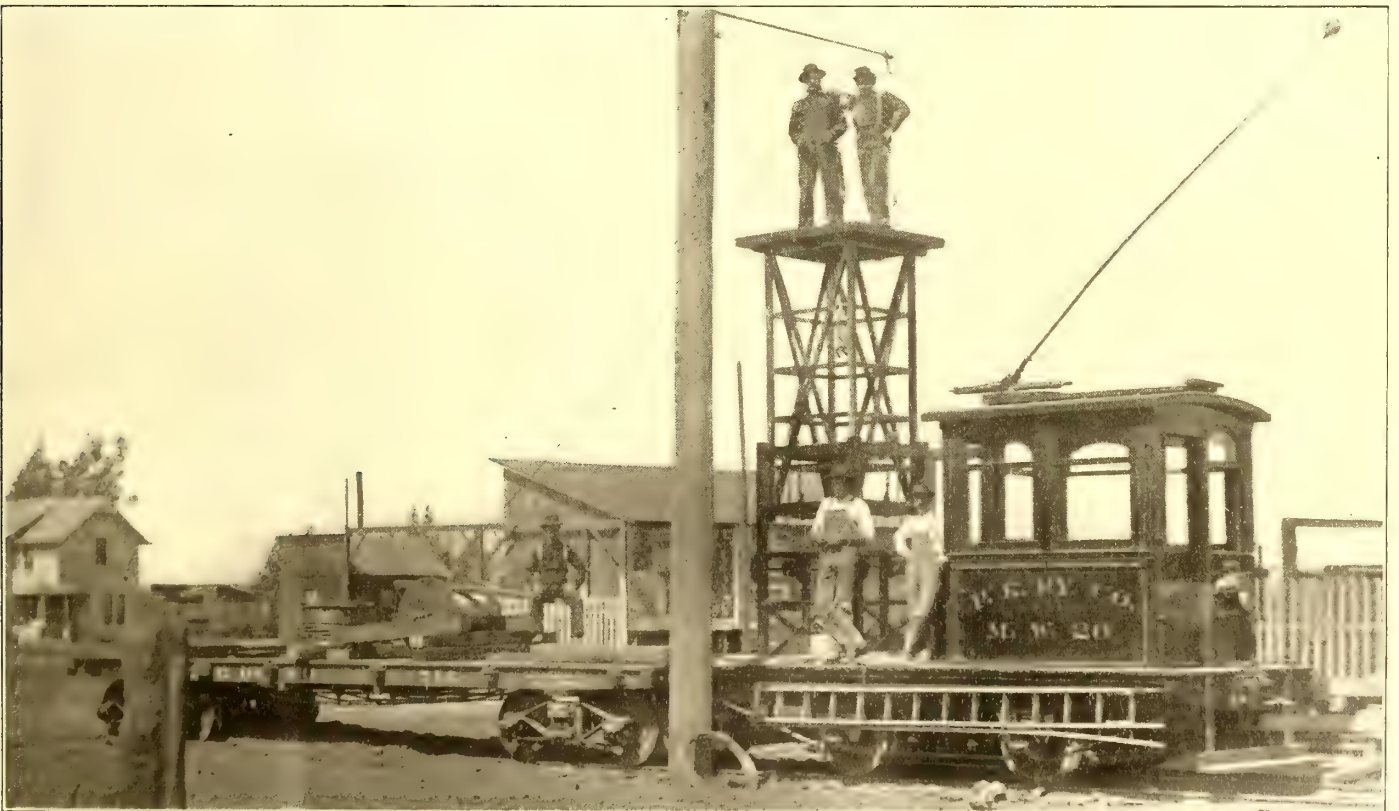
STRINGING LIVE TROLLEY WIRE WITH TOWER CAR
